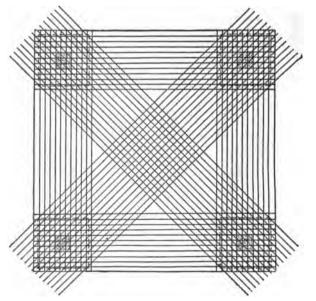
Showing Strips and Capitals of Columns in Girderless Floor.
